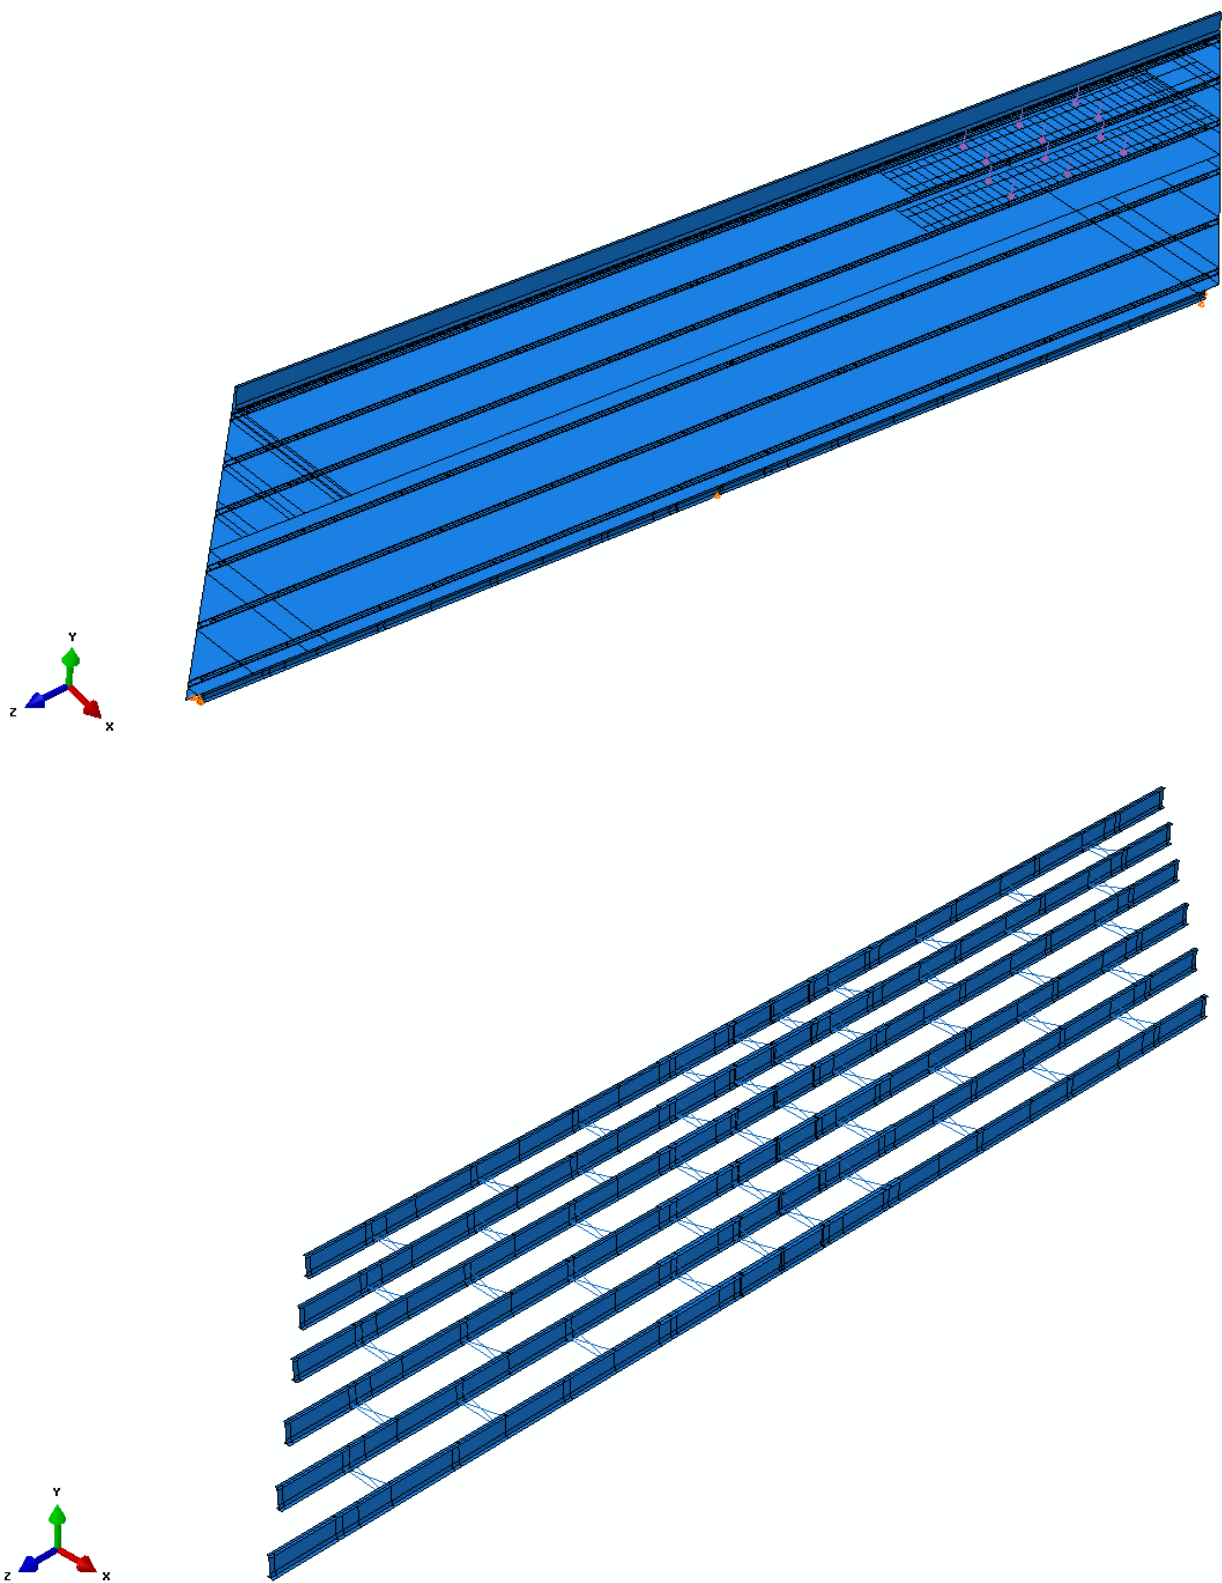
Top: isometric view of B-70-177 model. Bottom: concrete deck hidden to show bridge framing
